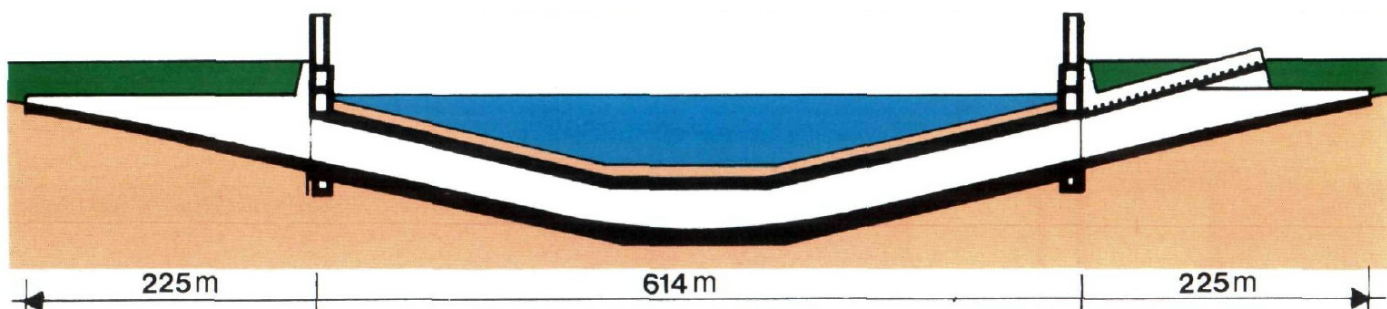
Longitudinal cross-section of the Heinenoordtunnel [21]
